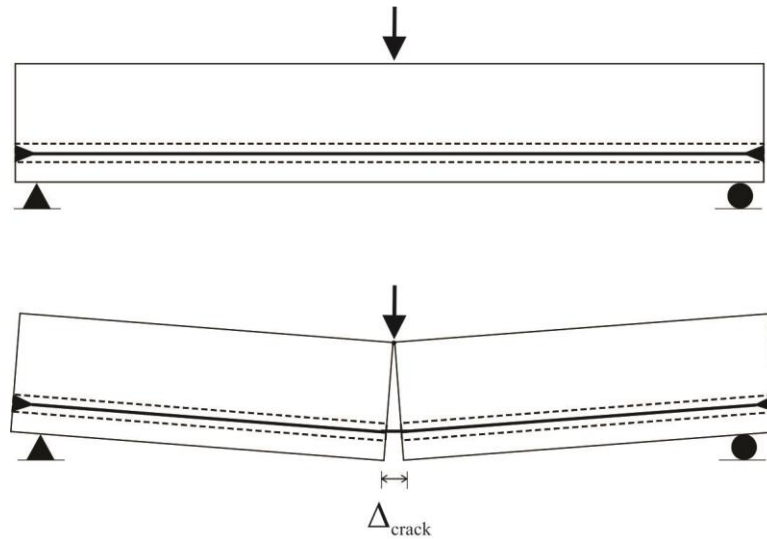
Crack opening in simply supported beam with unbonded tendon
